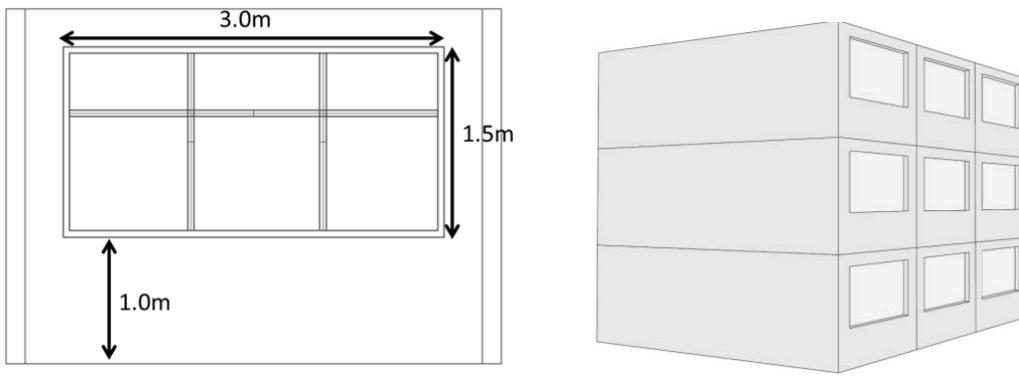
Façade section and view of multiple reference offices stacked together to form a facade
